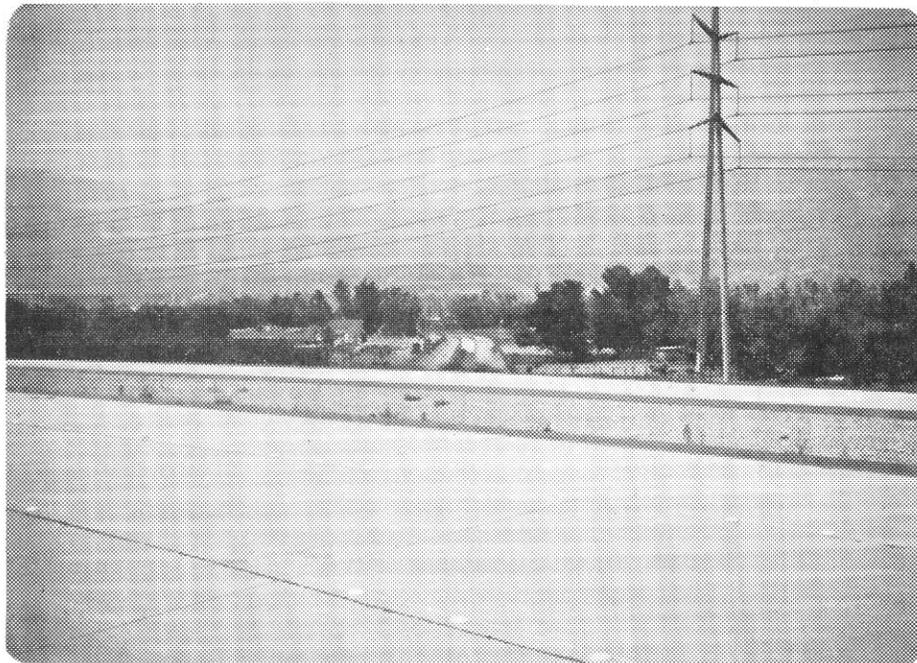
Eastbound lanes at Polk Street Undercrossing. Further examples of slab separation at joints.
